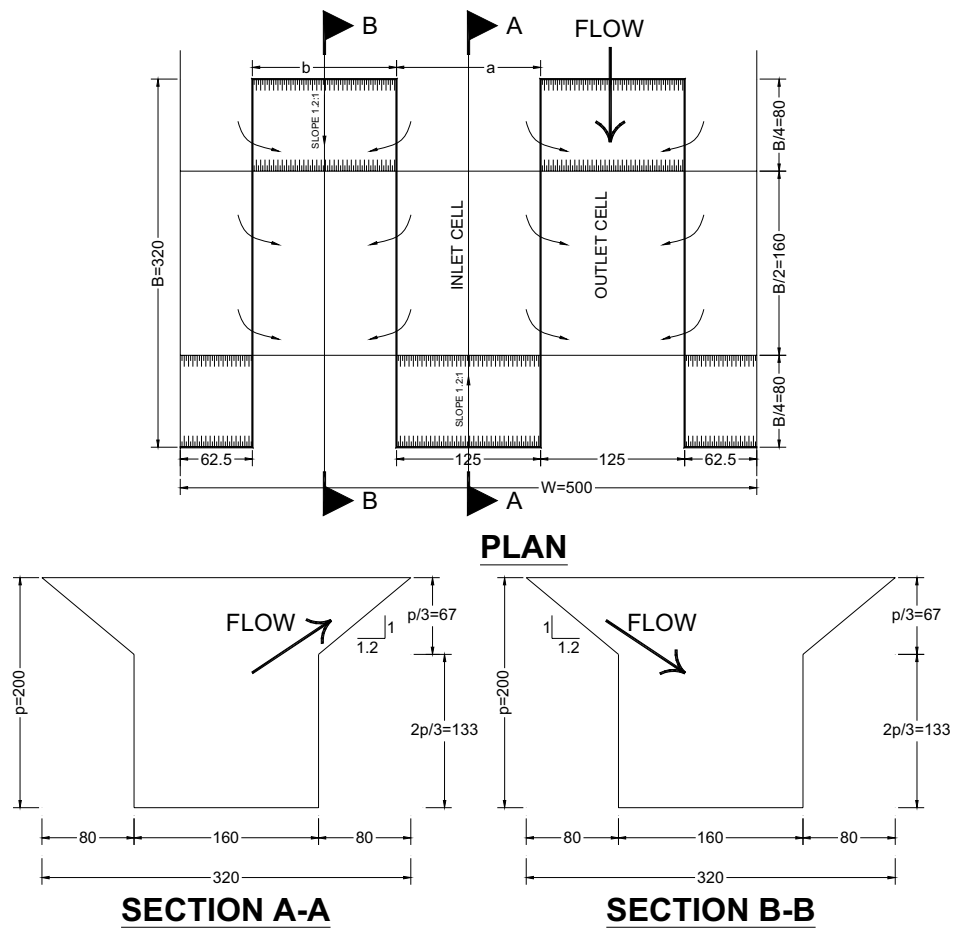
Plan and section of model P_1M_6 (dimensions in mm)
